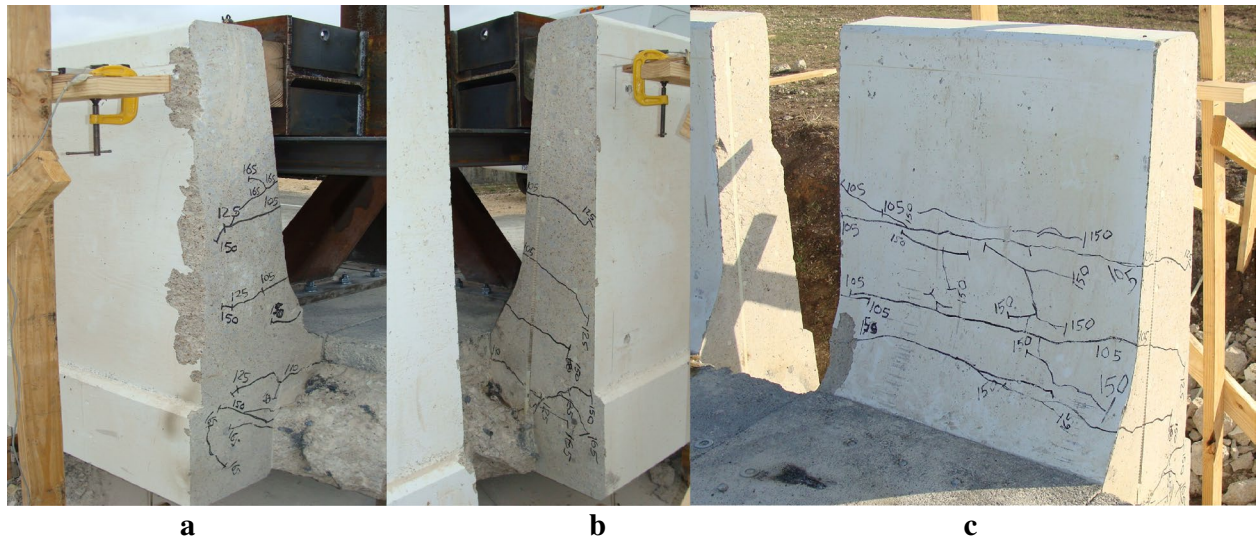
Crack pattern in the 1000 mm length barrier wall at interior location. a Left side, b right side, c front side.
